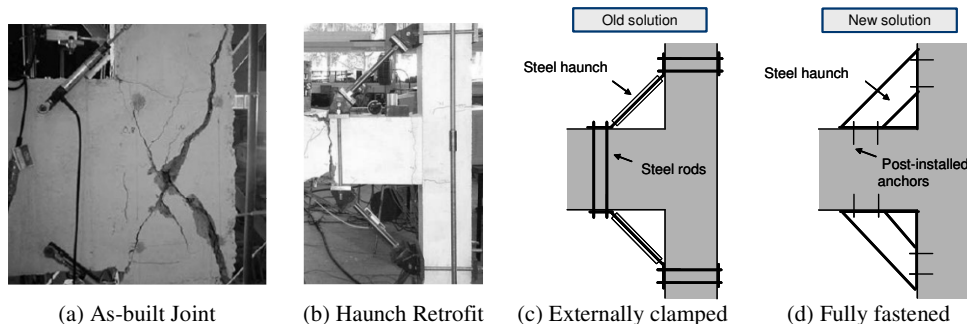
Haunch Retrofit Solution for exterior beam column joints (Pampanin et al., 2006; (Genesio and Akgüzel, 2009)
